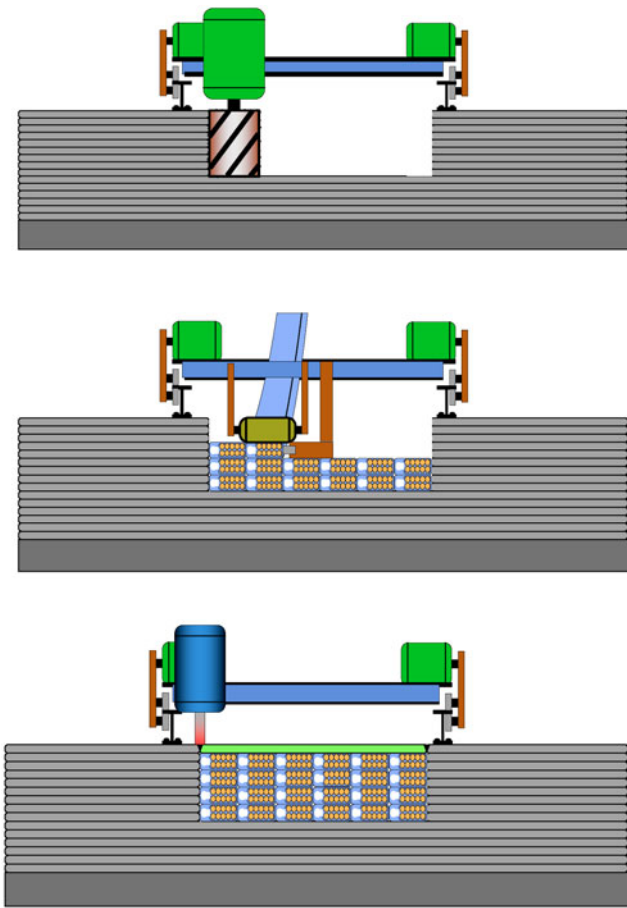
Steps in milling grooves, installing coil cables, and securing coil cover plates.
